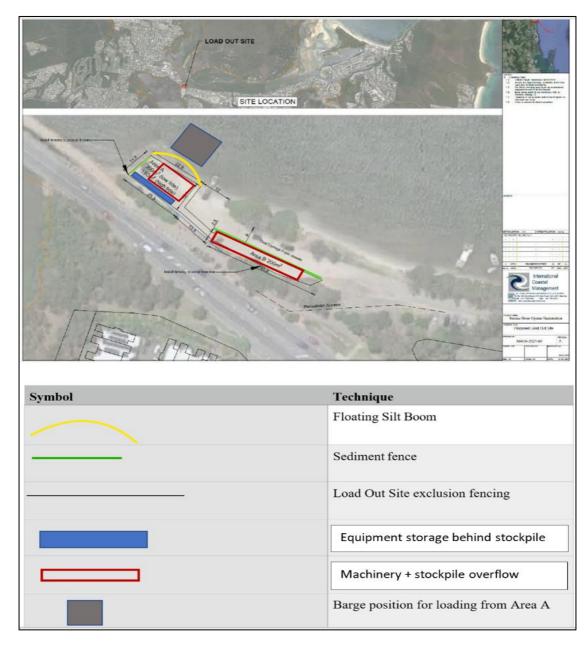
Construction load-out site located on Hilton Esplanade, Noosaville.
